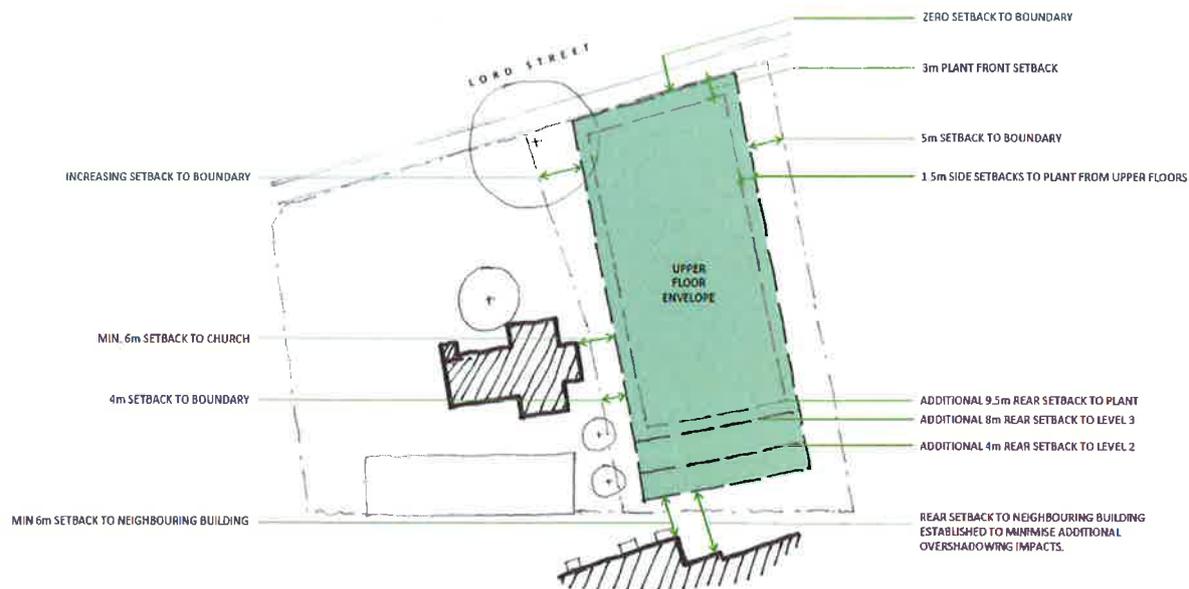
Indicative building envelope and setback – Upper floors (Source: Planning Proposal & BuiltConsult Pty Ltd)
